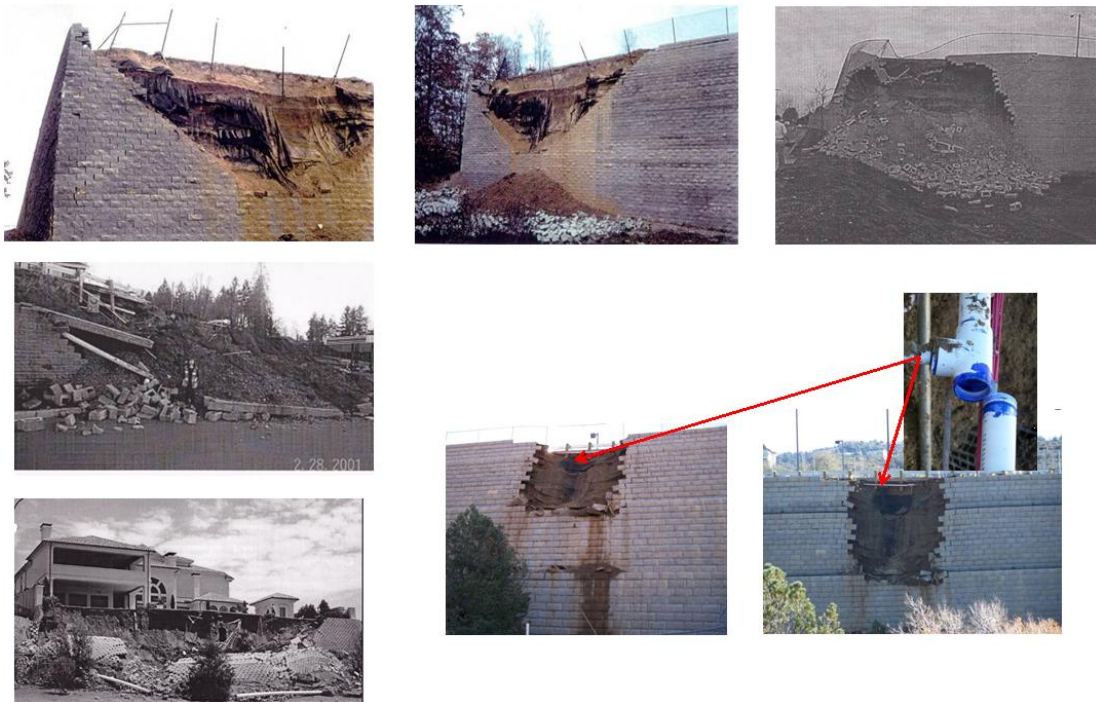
shows examples of MSE walls with excessive deformation. These walls should be considered for monitoring to determine if the deformations are ongoing or if they cease to have further movement. These are, of course, critical assessments. Figure 2b shows examples of MSE walls which have collapsed in whole or part. These situations might also be candidates for monitoring so as to assess if the remaining standing sections on either side of the collapse are moving or are stable.
